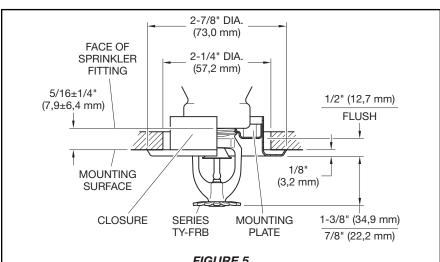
SERIES TY-FRB RECESSED PENDENT SPRINKLER ASSEMBLY (TY323) WITH TWO PIECE 1/2 INCH TOTAL ADJUSTMENT STYLE 20 RECESSED ESCUTCHEON
